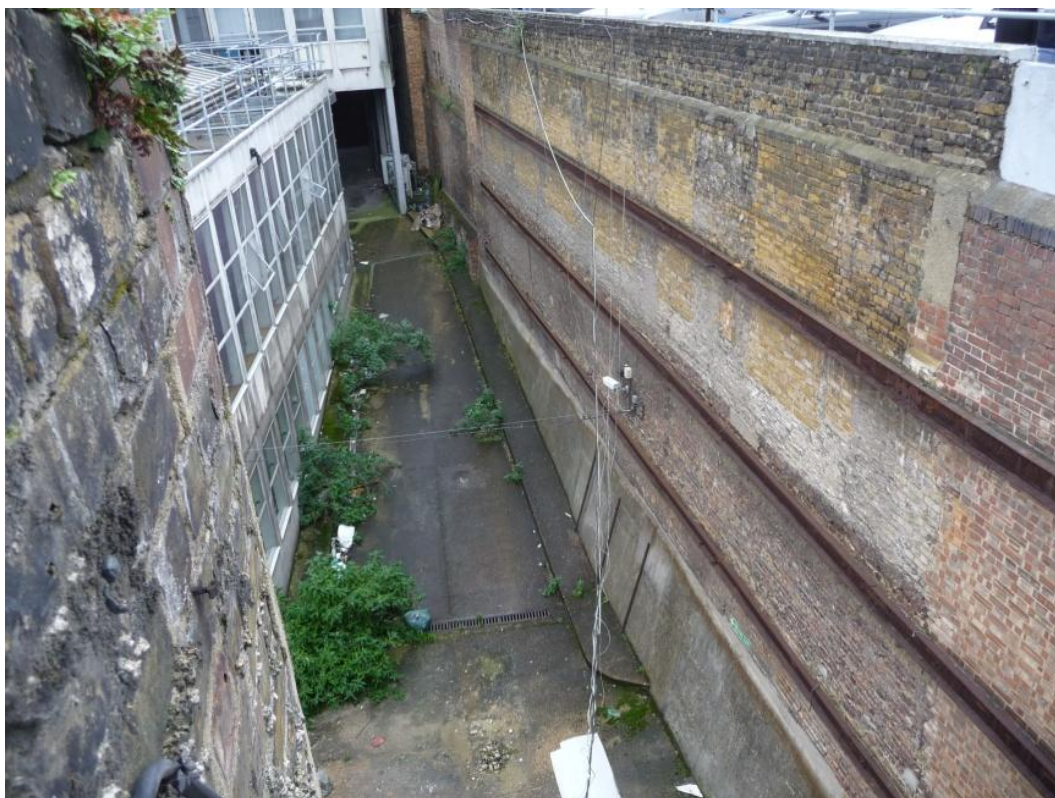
View west of plot at 12-20 Paul Street taken prior to evaluation in 2012. The brick wall at the right of the photo is wall [55] recorded at depth during the watching brief. The lower ground level was the external subterranean car park where Trench 1 was excavated.
